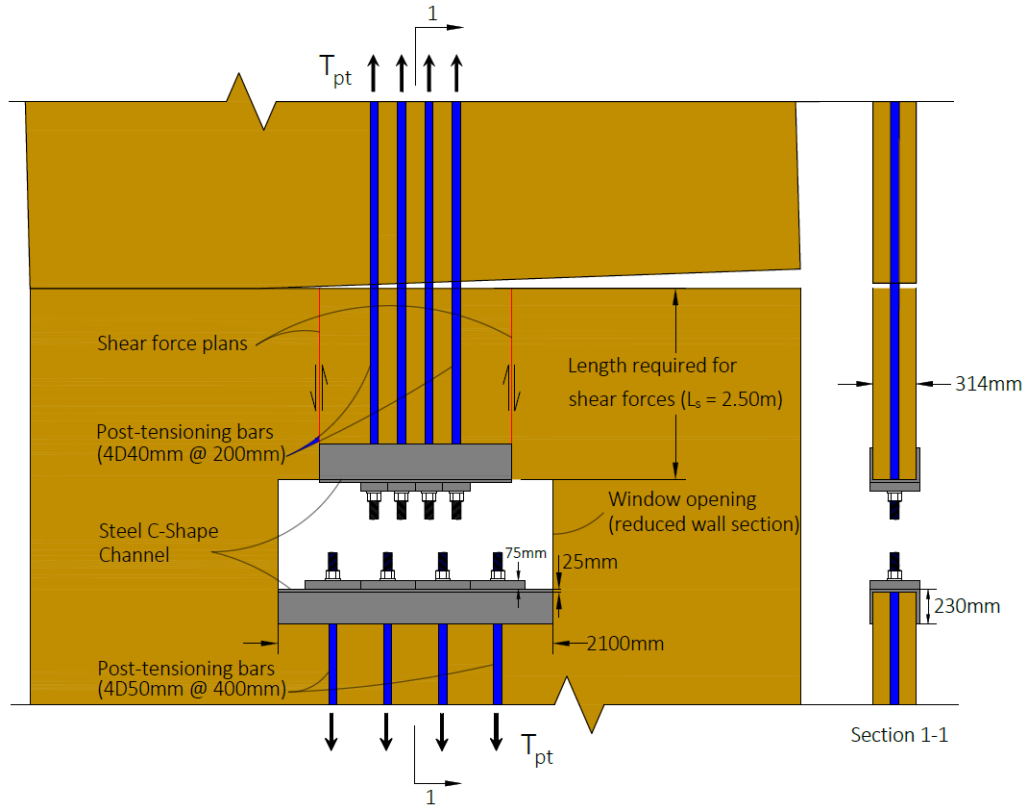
Connection design for multiple rocking segment system of wall M1X
